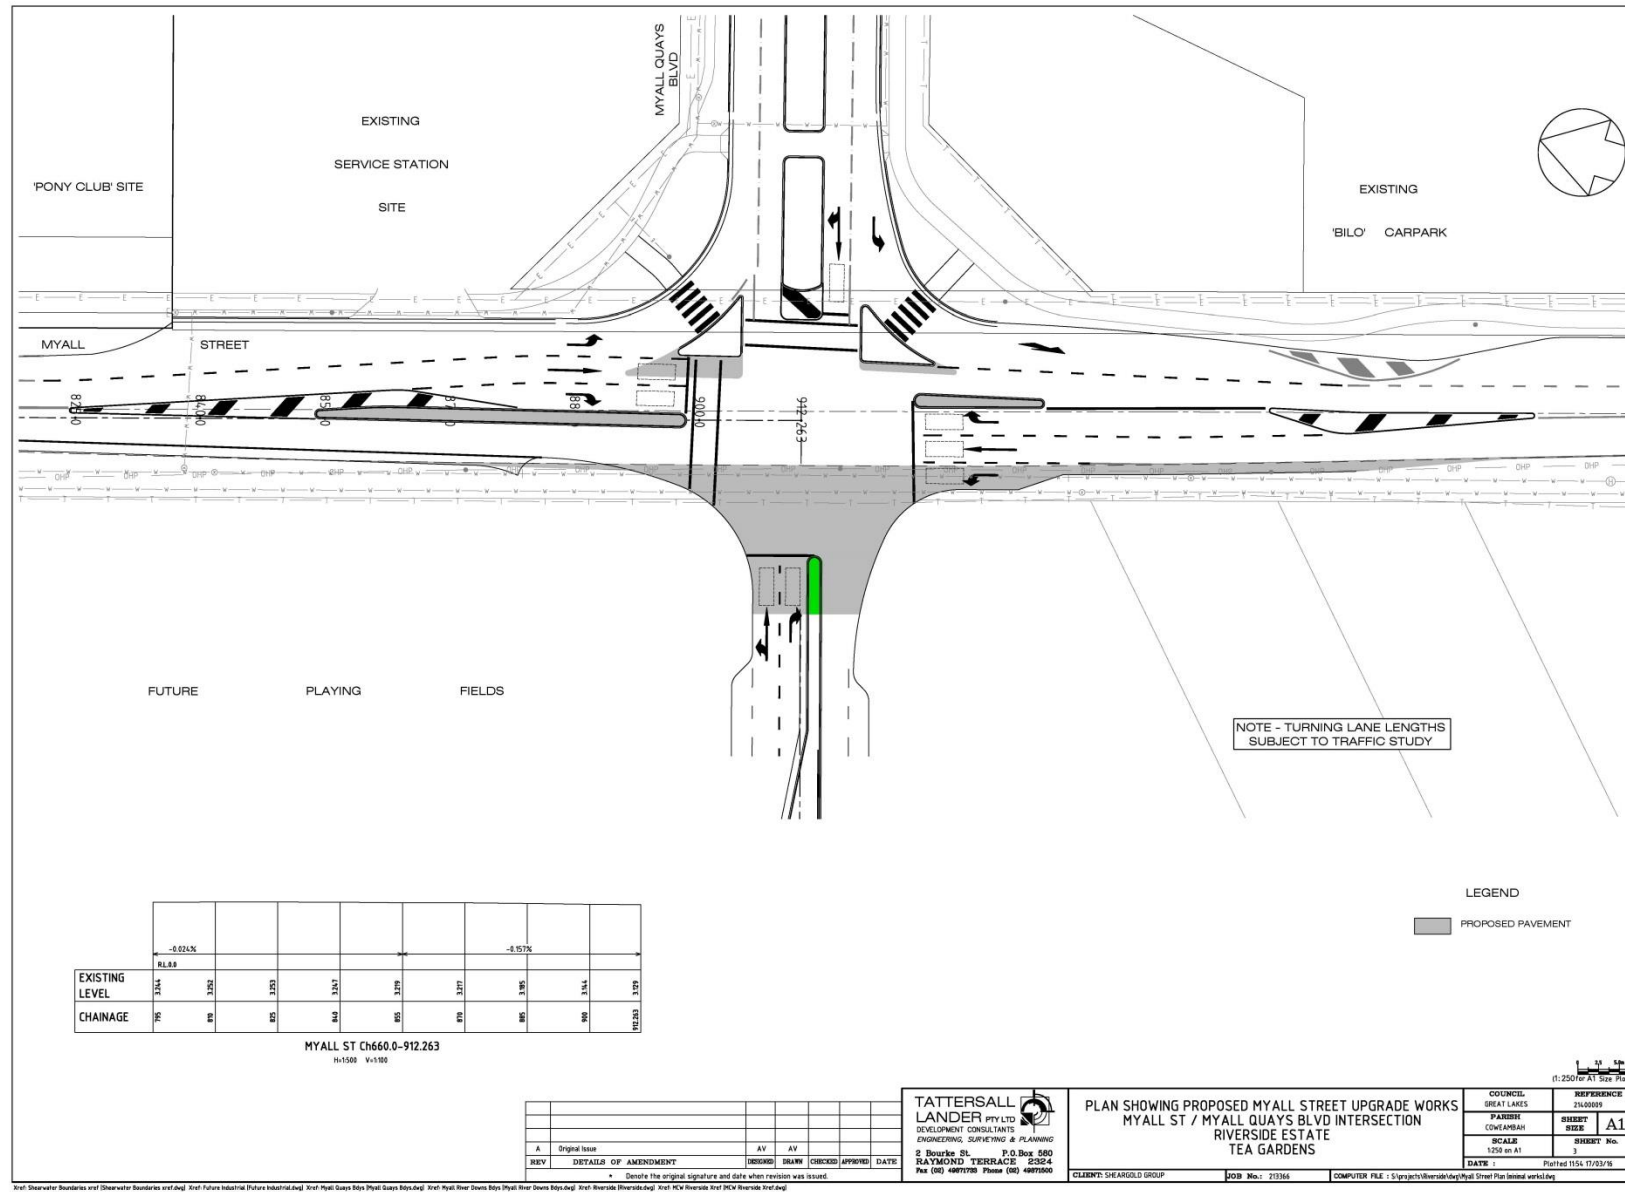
Proposed Intersection Treatment at Riverside Boulevard
